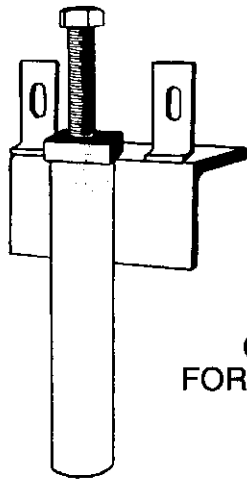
TYPICAL INSTALLATION OF NEW-CONSTRUCTION FOUNDATION BRACKET
